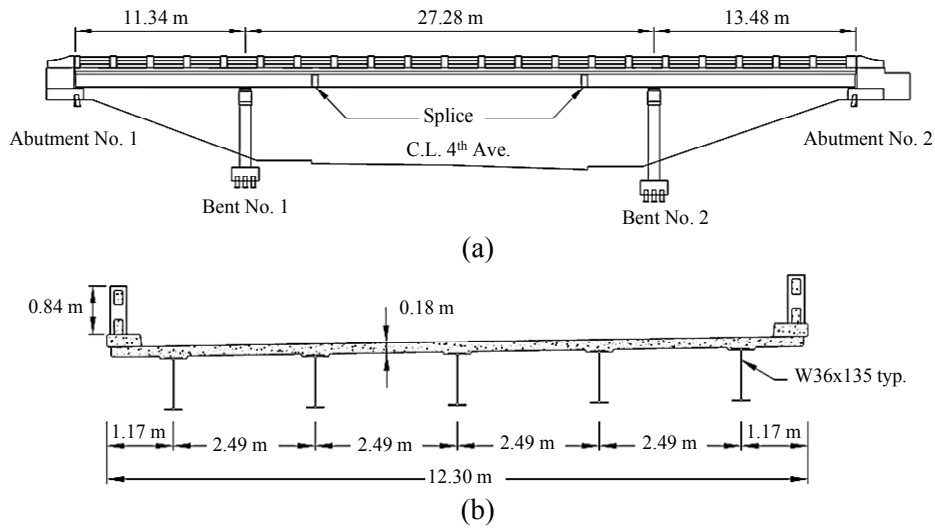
I-40 westbound bridge over 4th Avenue: (a) Longitudinal profile (b) Cross-section (modified from Ragland 2011)
